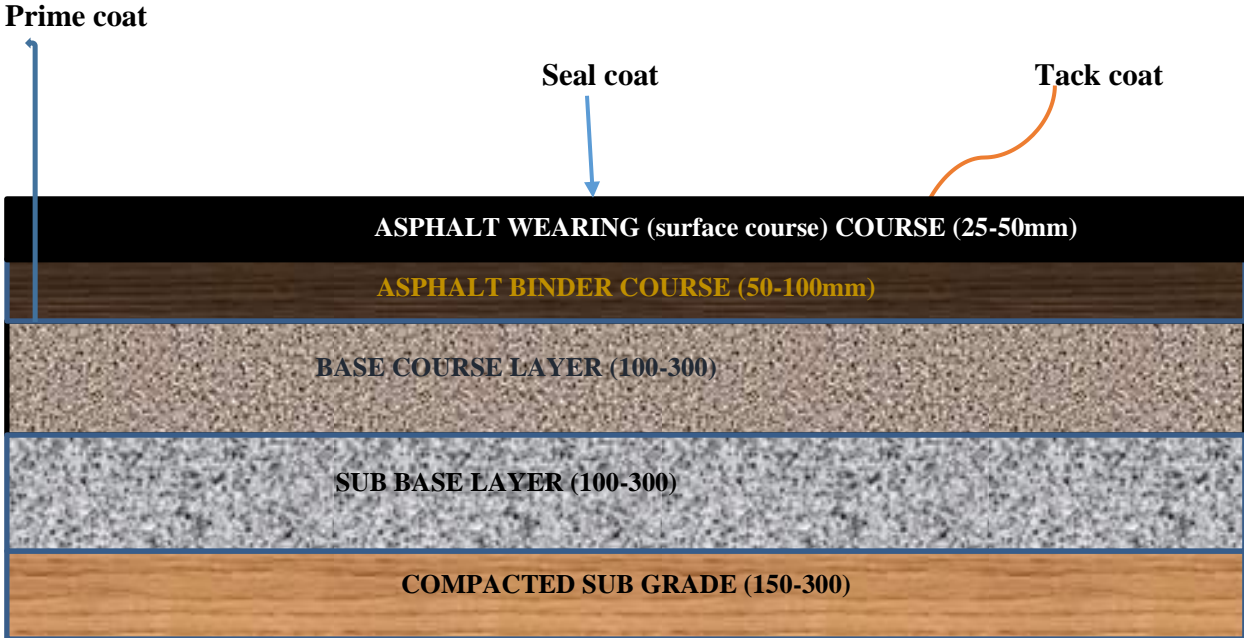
Typical Cross section of Flexible Pavement. (Chandra,2020)
